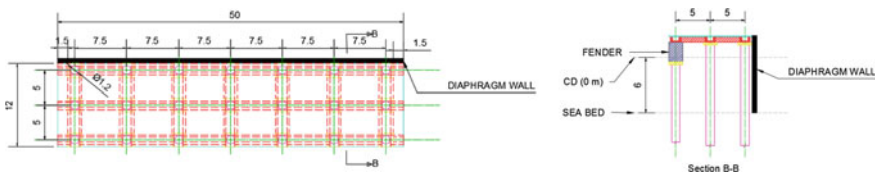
Plan and elevation of Type 3 structure (cantilever wall attached to the jetty) (all dimensions in “m”)
